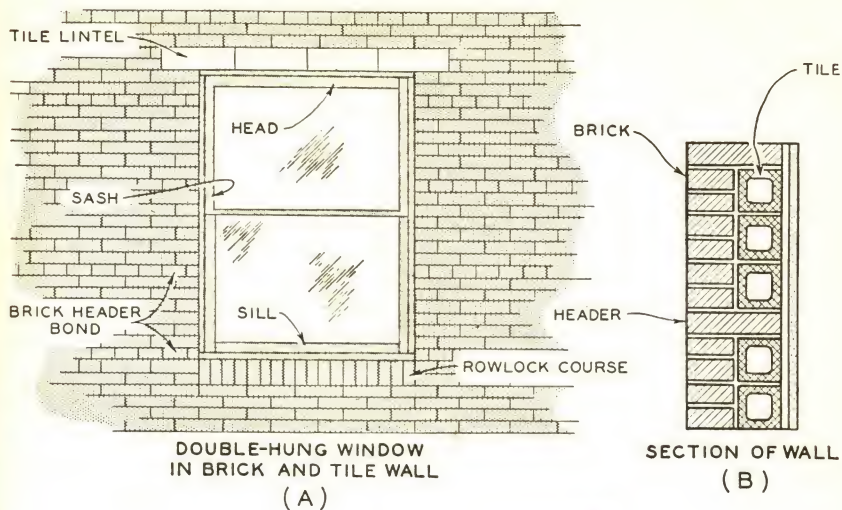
Pictorial, Elevation, and Section Views of Head and Sill Sections of a Double-Hung Window in a Brick and Tile Wall
